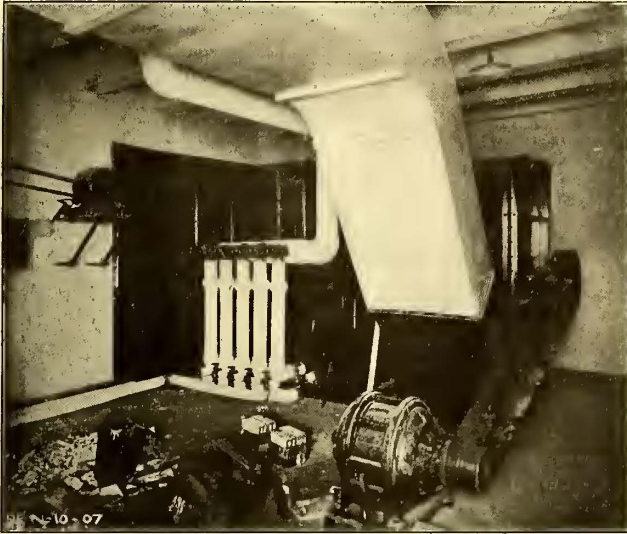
HEATING AND VENTILATING ROOM IN SWITCH HOUSE
